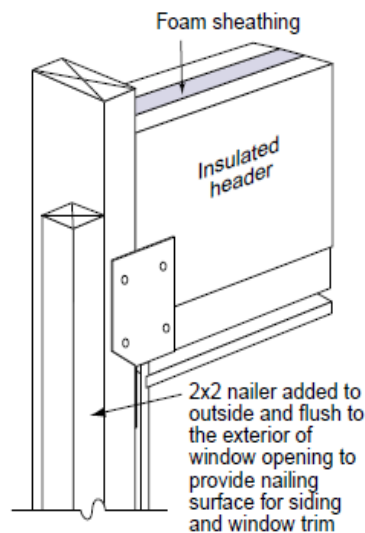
Example of Advanced Framing Techniques (U.S. Department of Energy; NAHB 2009)
